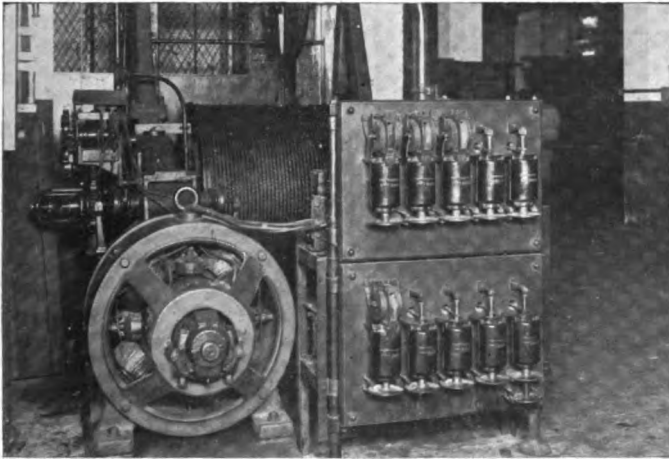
ELEVATOR MOTOR WITH CONTROL ARRANGED FOR DYNAMIC BRAKING
